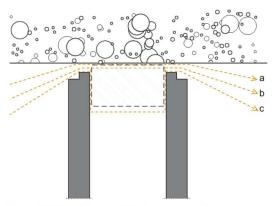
Possible sound leaks at connections between an insulating wall and the surrounding structure
